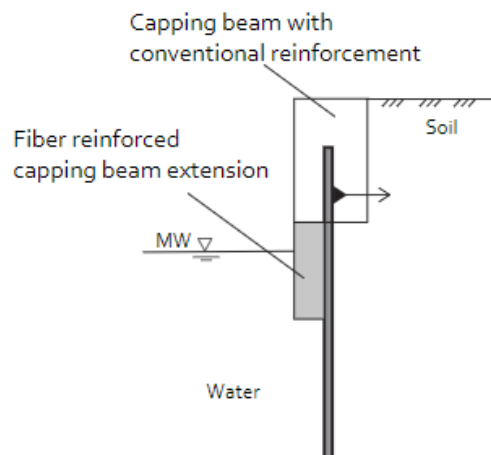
Illustration of the capping beam quay-structure with the proposed design. Fiber reinforced concrete is used for replacing reinforcement bars in the capping beam extension and conventional reinforcement bars are kept in the capping beam.
